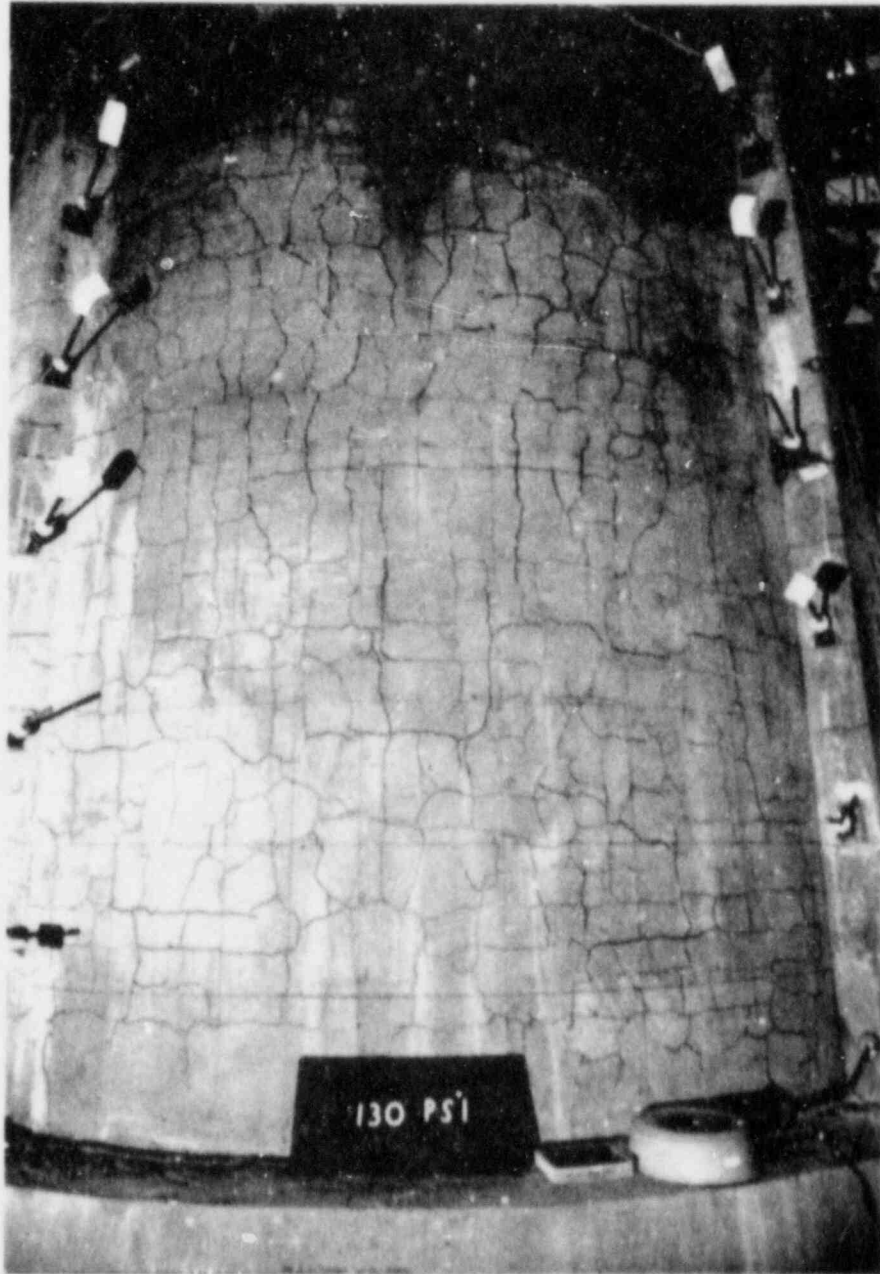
Cylinder Wall Cracking at 130 psig
